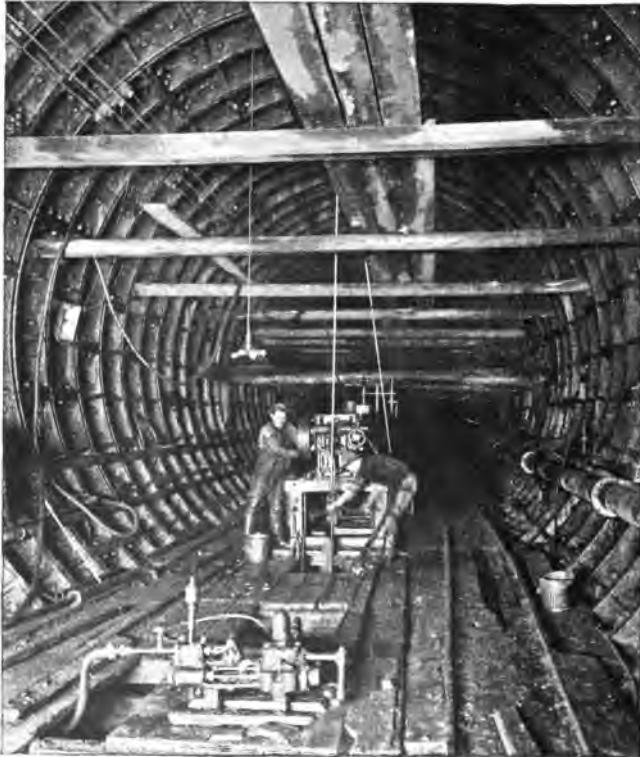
Exploring with boring machine, Pennsylvania Railway Tunnel, New York.
